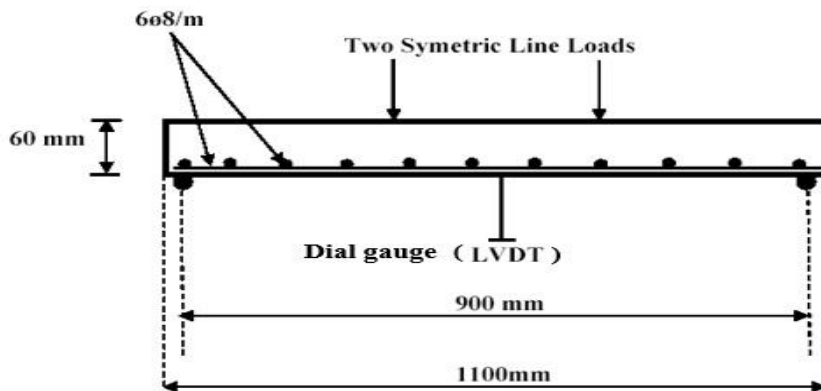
Typical concrete dimensions and reinforcement details (All dimensions in mm)
